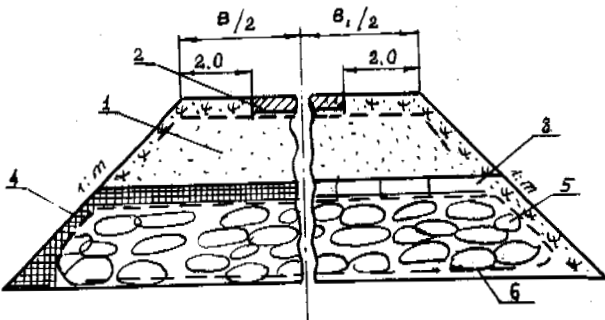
Structure of the sand embankment with heat-insulating interlayers and semi-envelopes of geotextile: 1- sand; 2- pavement slabs; 3- plastic foam; 4- peat; 5- geotextile semi-envelopes; 6- lumpy soil
